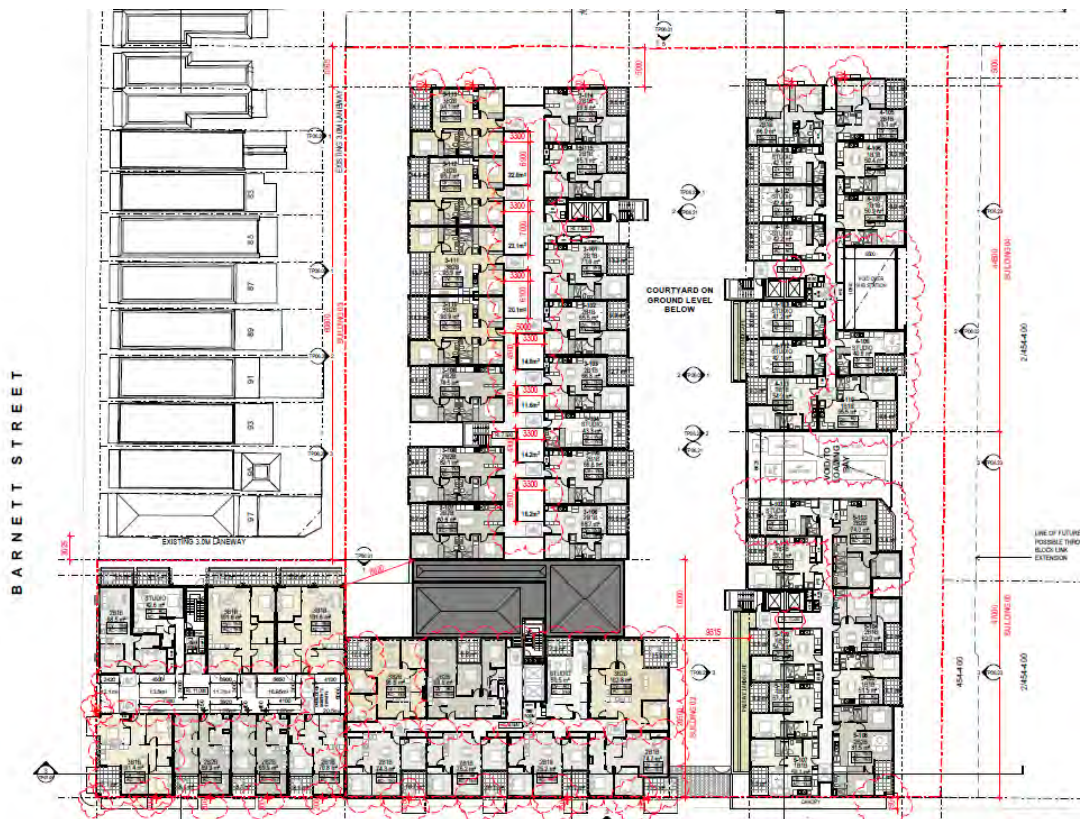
Level 1 Plan. From Drawings TP01.02 & TP01.03
